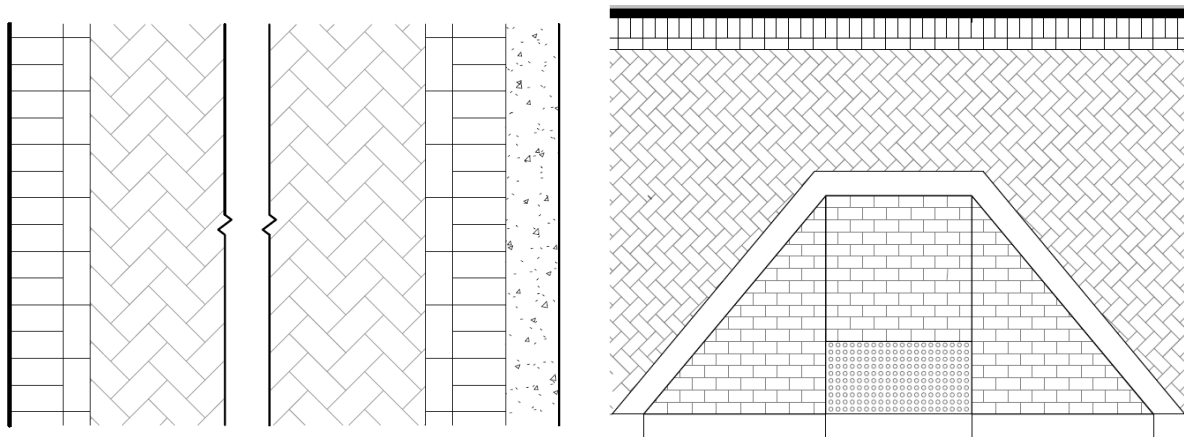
Sidewalks (left) and Curb Ramp (right) Design Standards
